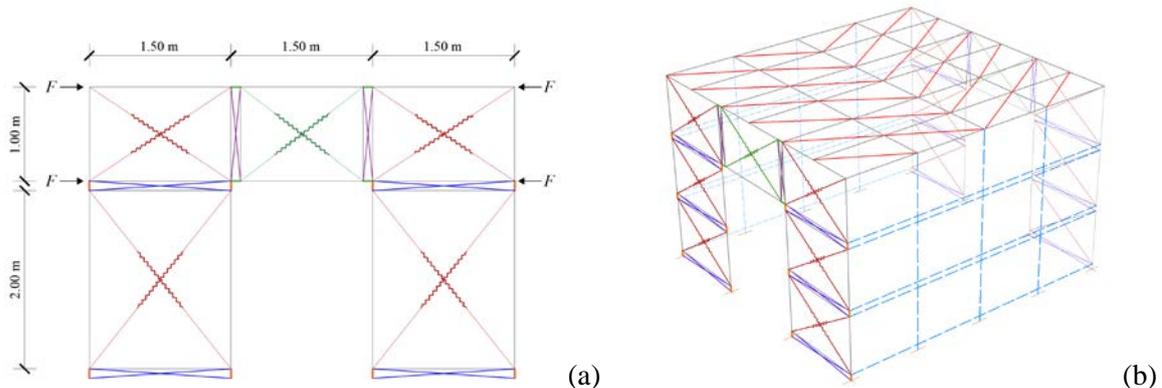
(a) Detail of CS-B model; (b) Full model of CS-D-1 with masonry macro elements, out-of-plane beams and floor macro elements
